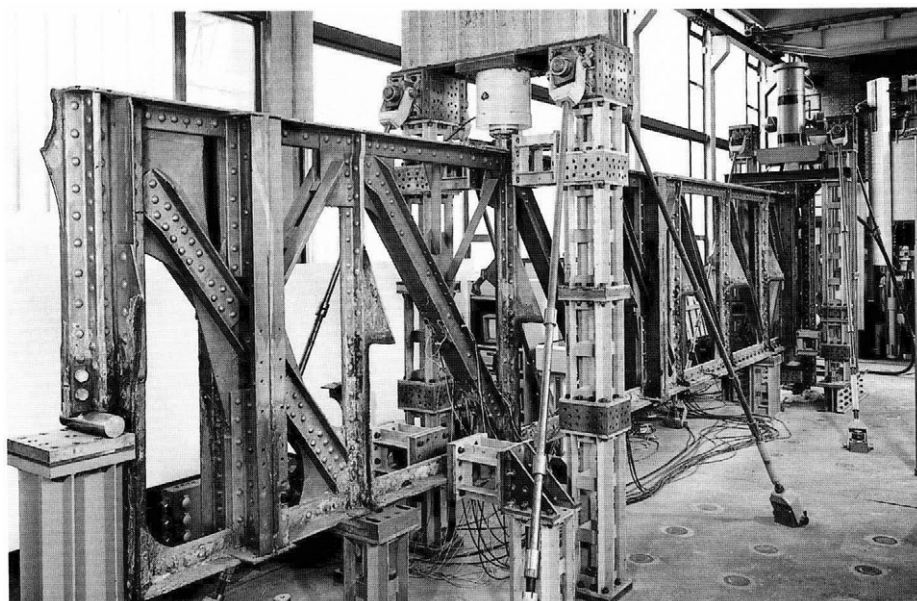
Truss girder of the Berlin Underground railway which had been dismantled and has been loaded cyclically in the testing hall
